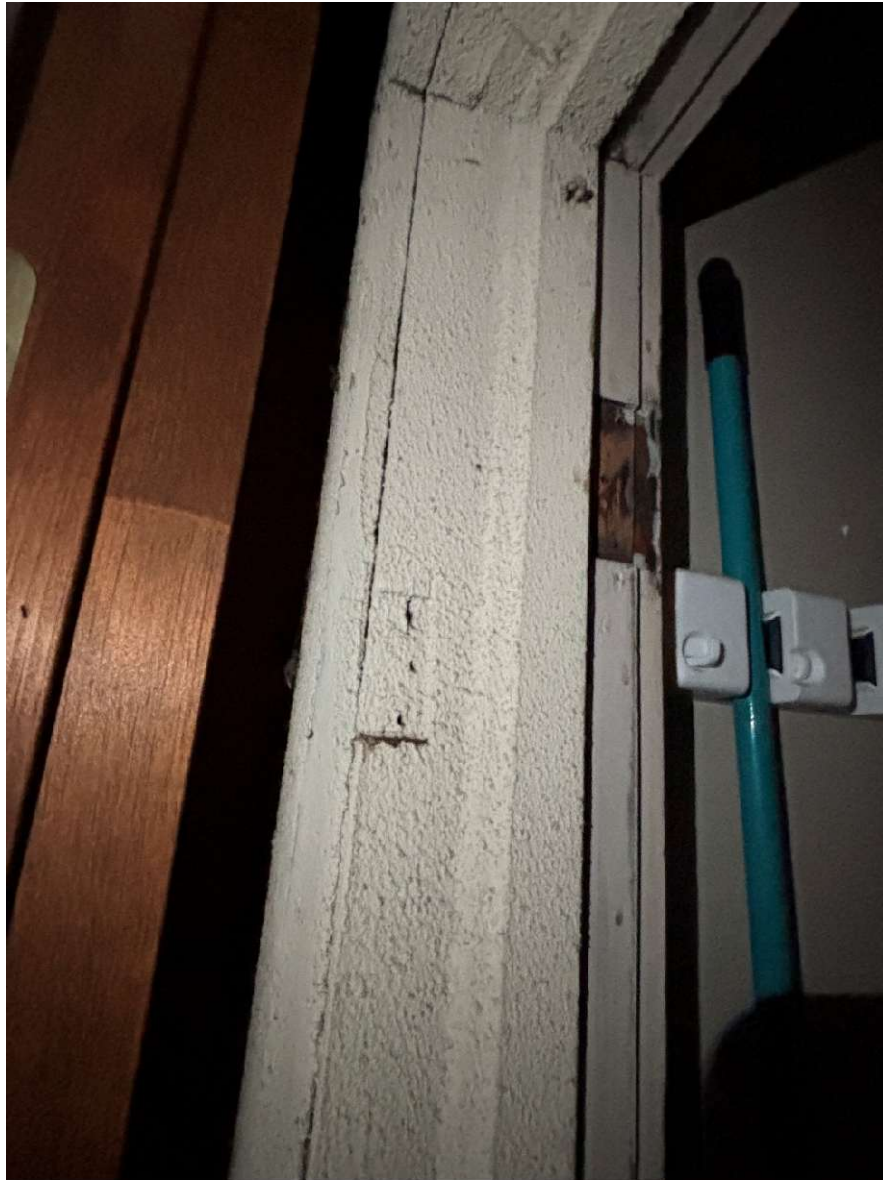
The original rear (east) door appears to be in a closet in the rear addition and under the new staircase in the original building.
